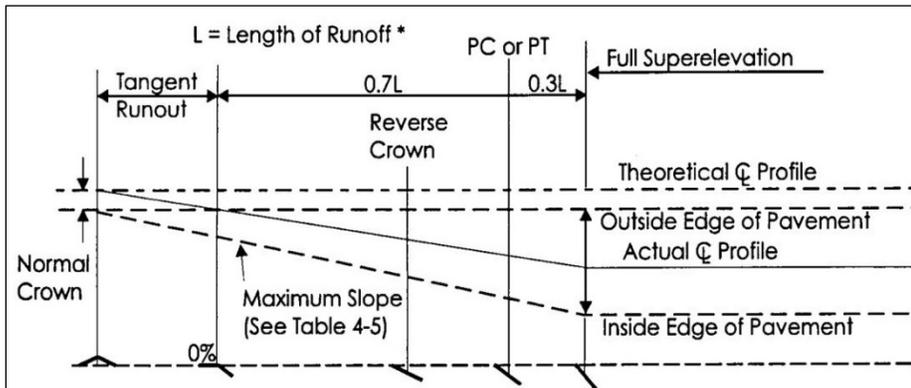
14: Superelevation Geometry – Pavement Revolved About Outside Edge
